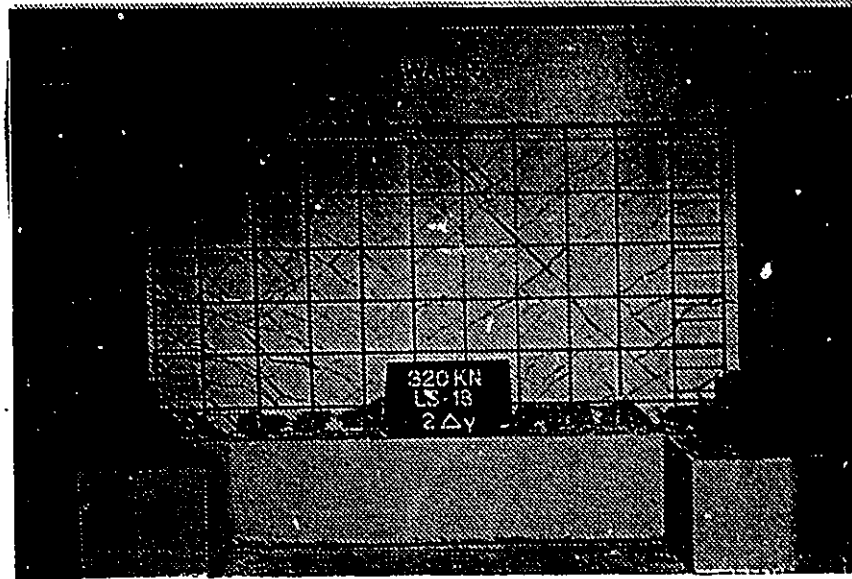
Wall 5 crack pattern at the end of cycles at $2\Delta_y$,
